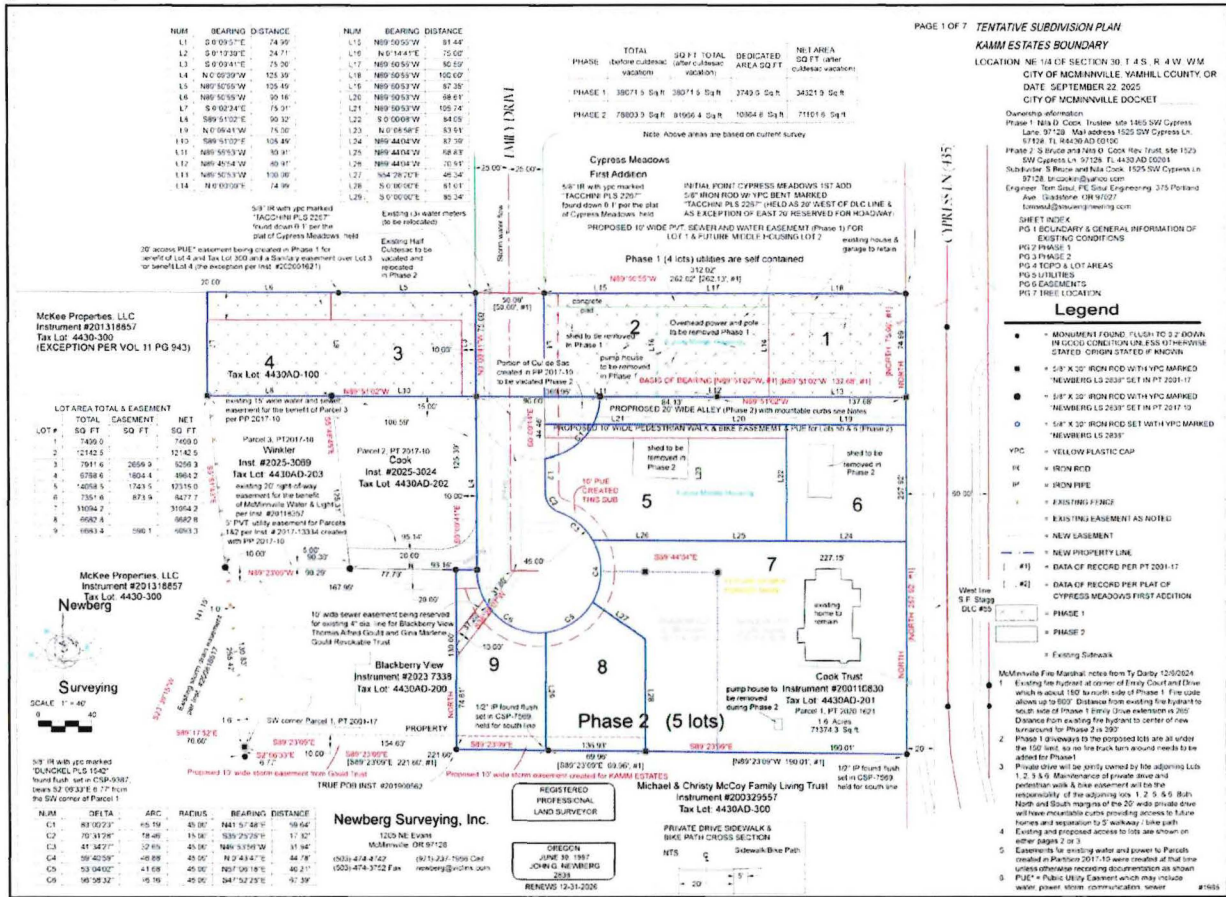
Applicant's Proposed Subdivision Tentative Plan and Future Development Plan (S 2-24)
